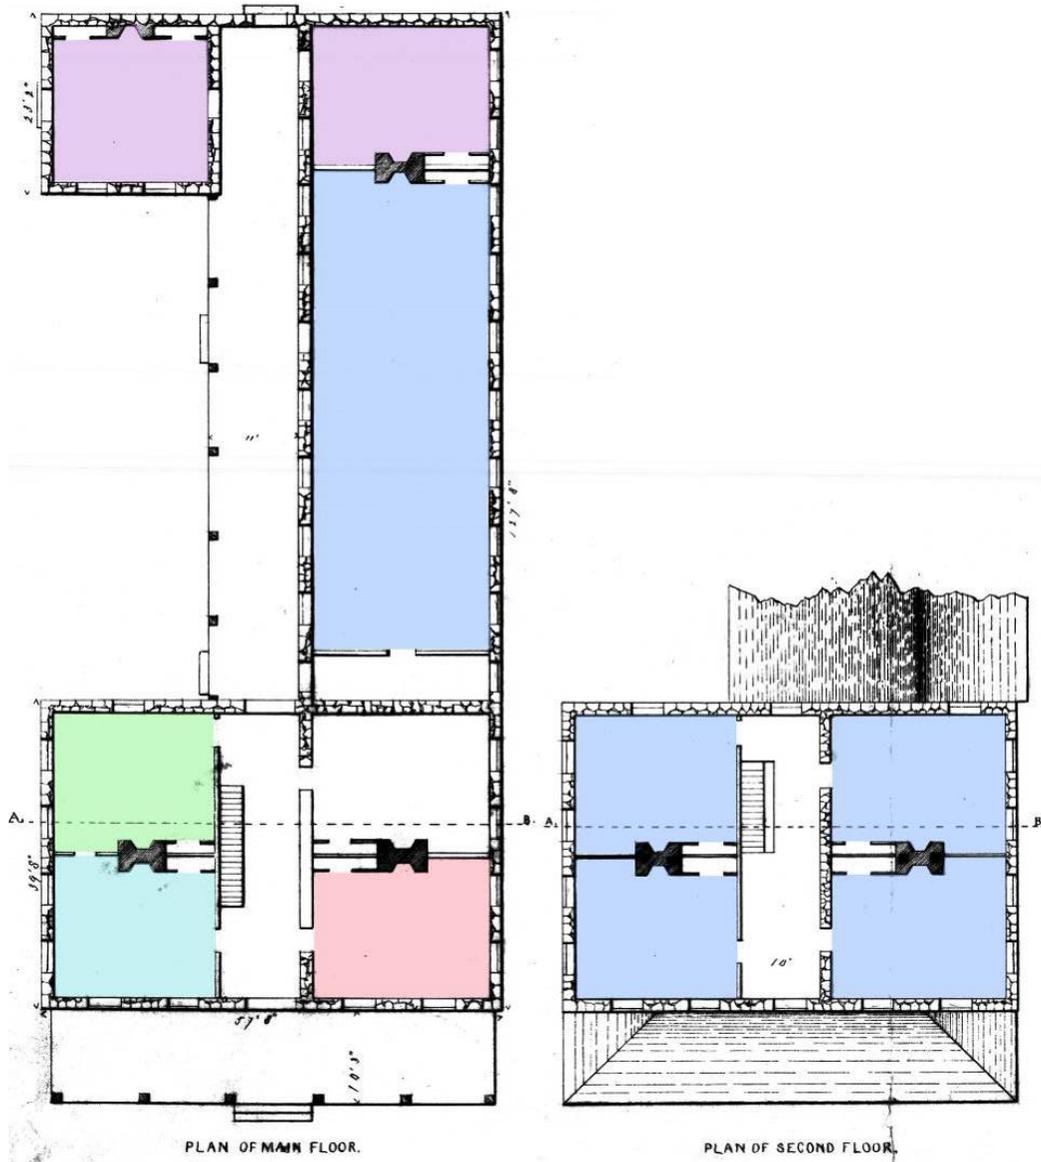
Hospital floor plan, Fort Riley, Kansas, 1873 (NARA College Park, RG 77 MISC Fort Files Fort Riley KS #28).
